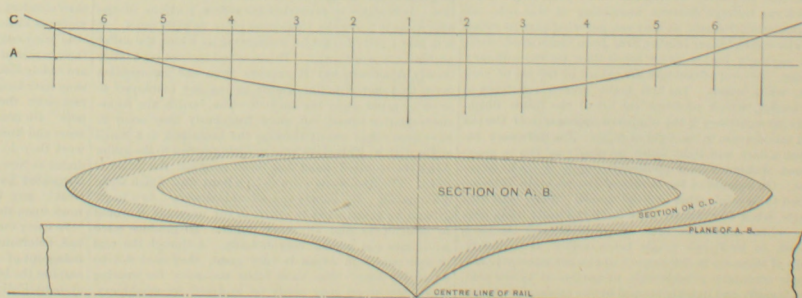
Elevation and Horizontal Sections of Flange Used on Lehigh Valley, and Delaware & Hudson Canal Co.'s Roads
